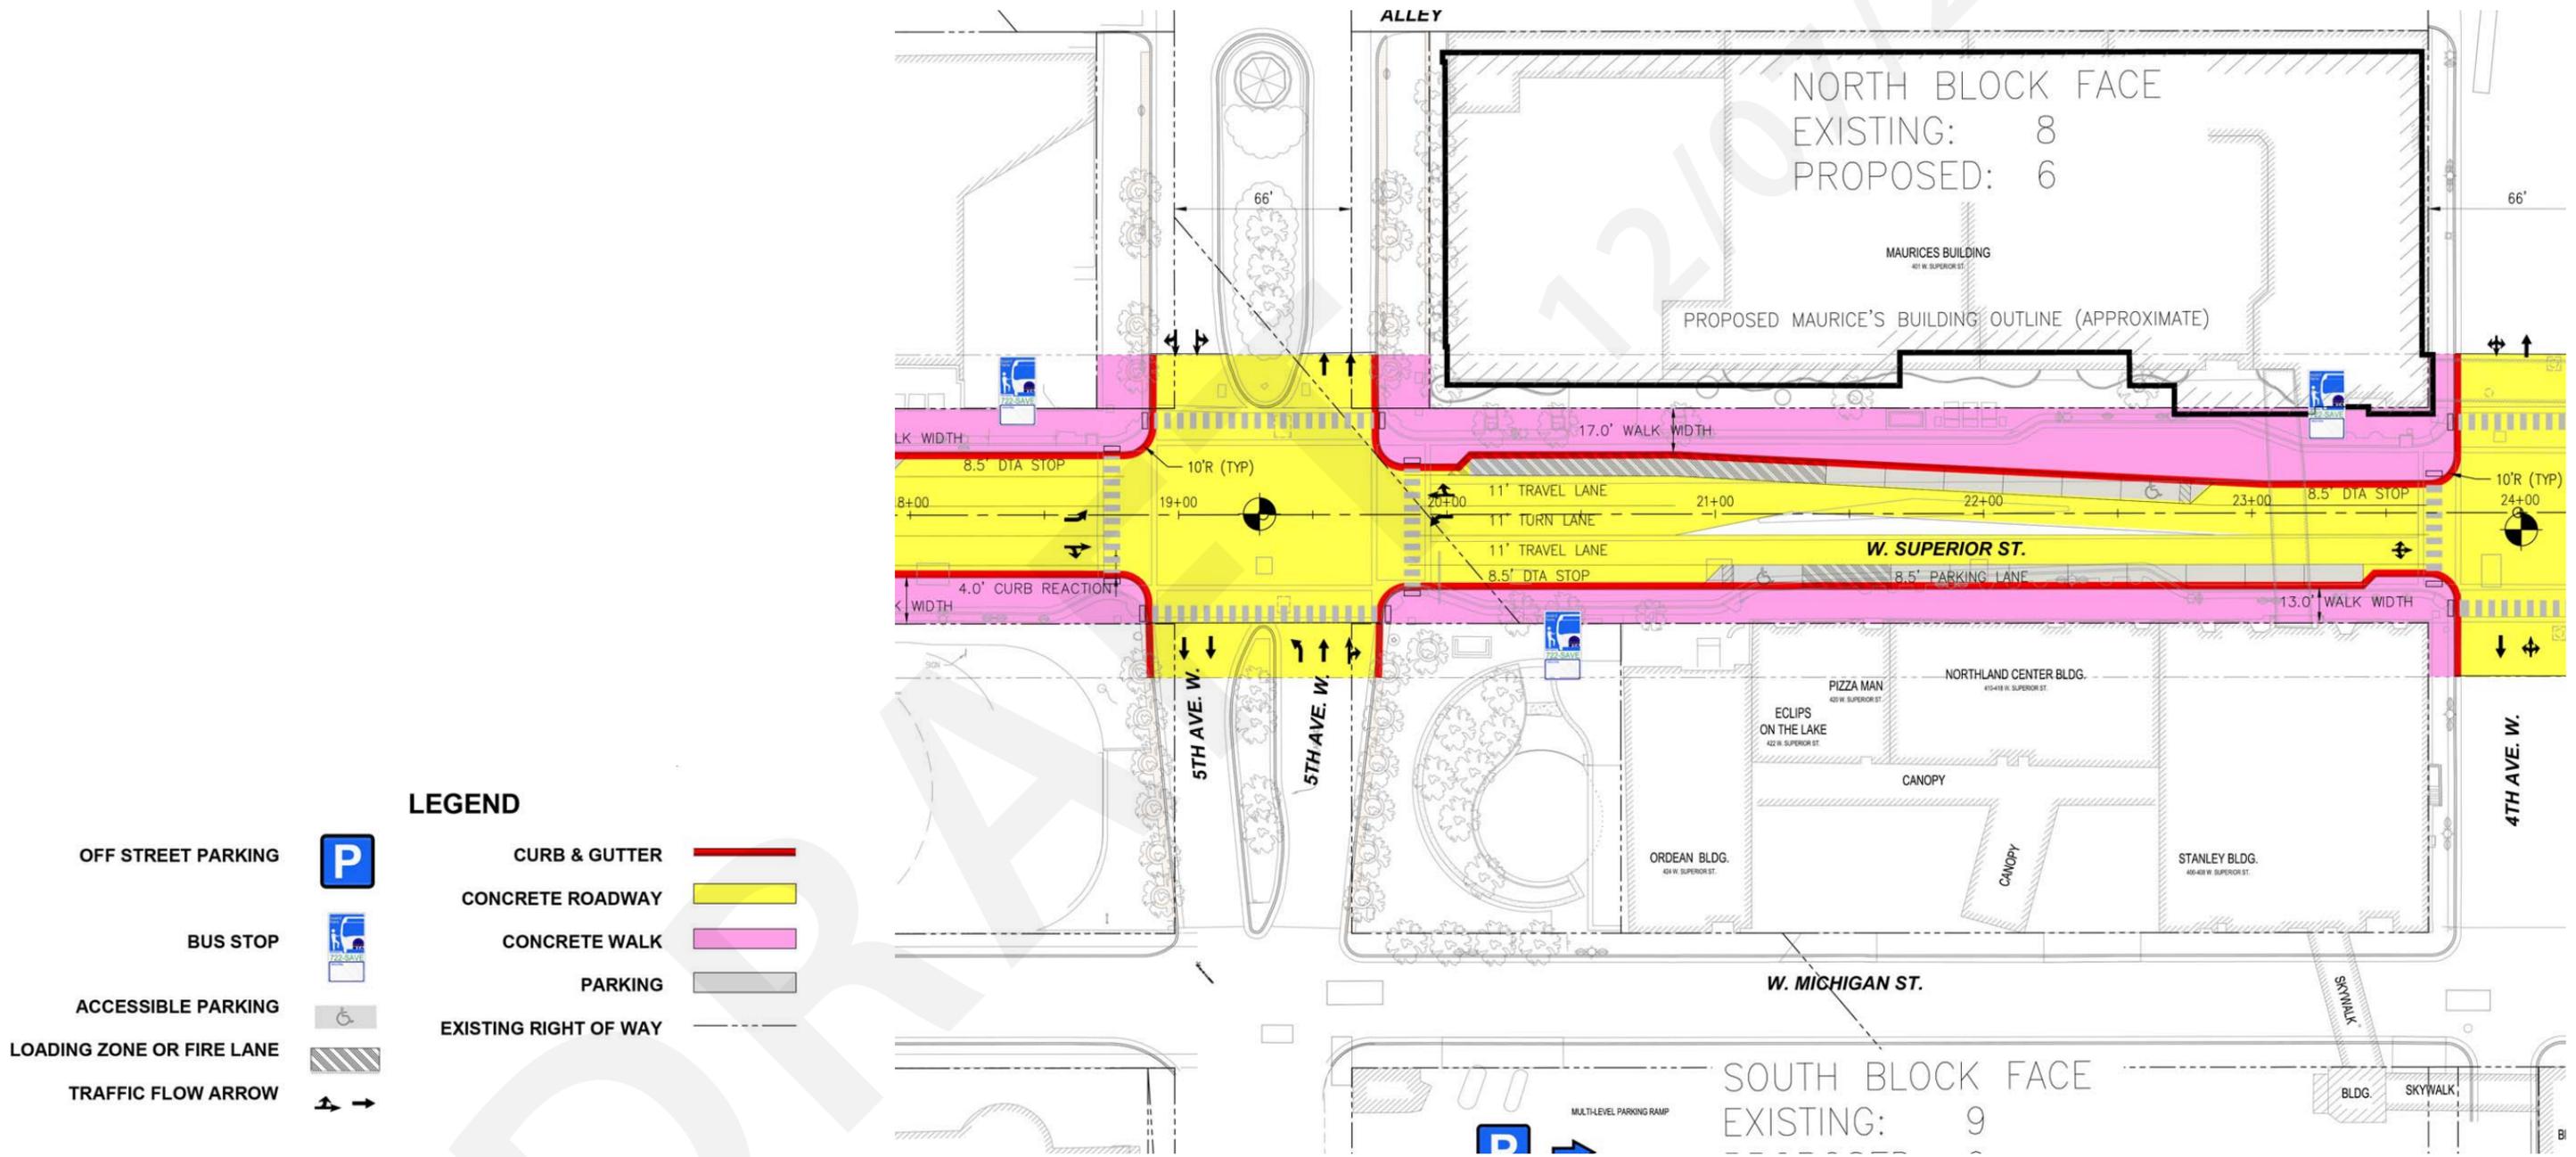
Proposed street layout between 5th Ave West and 4th Avenue West.
